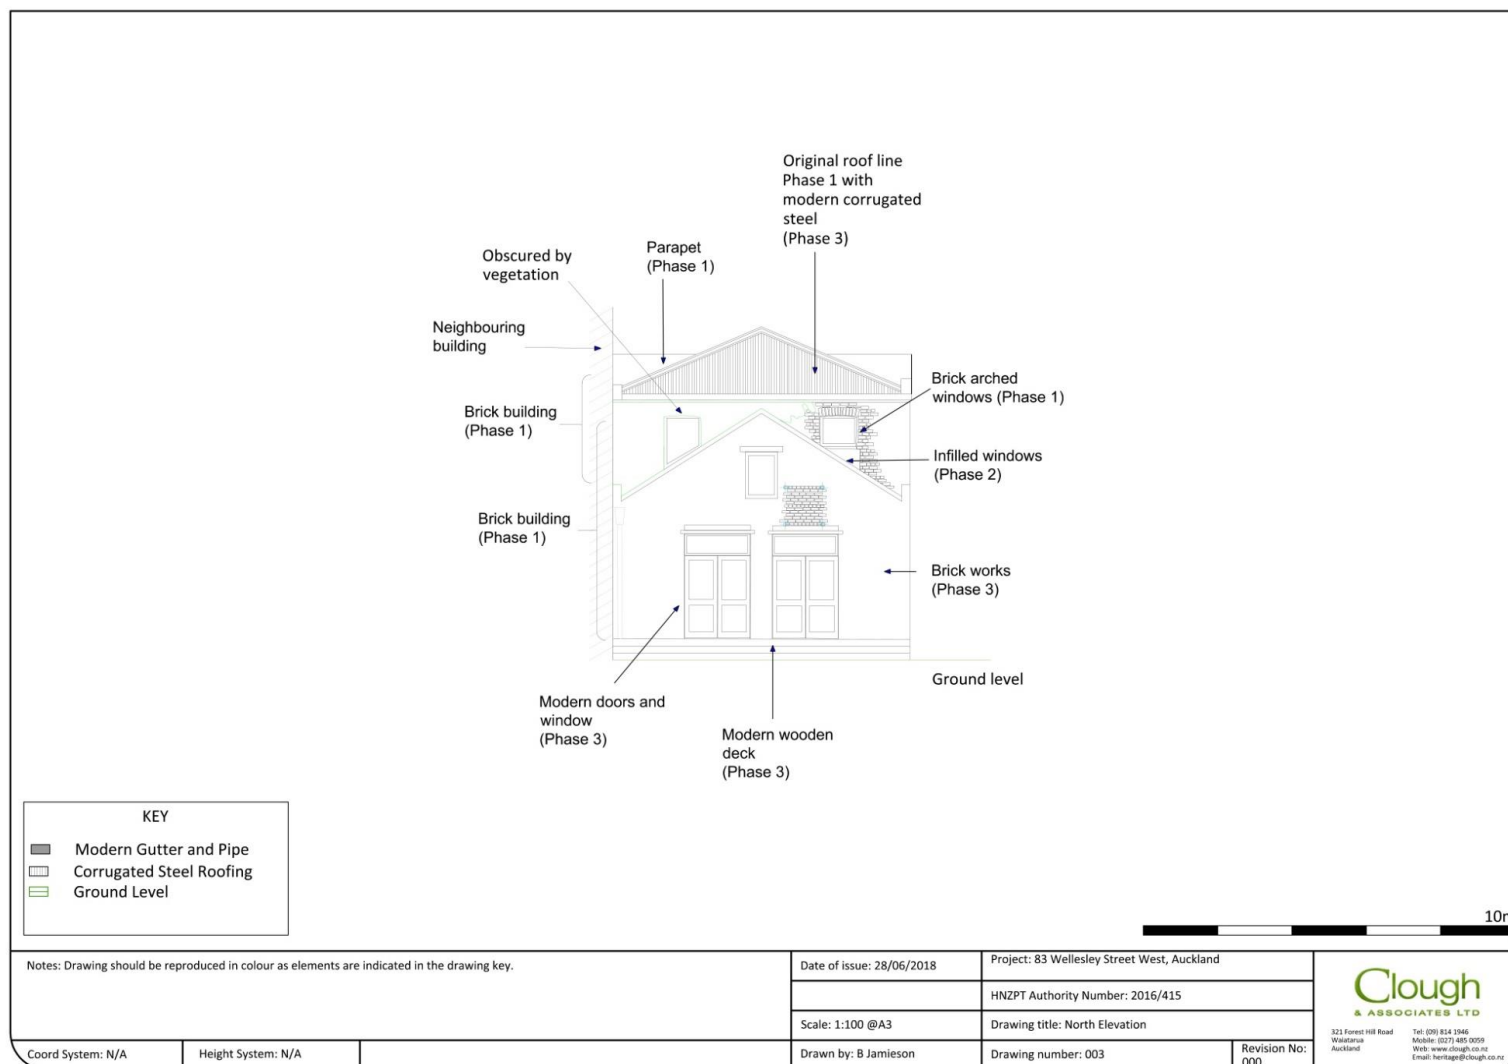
Rear (north facing) elevation of 83 Wellesley Street West (source: Clough & Associates, 2015)
